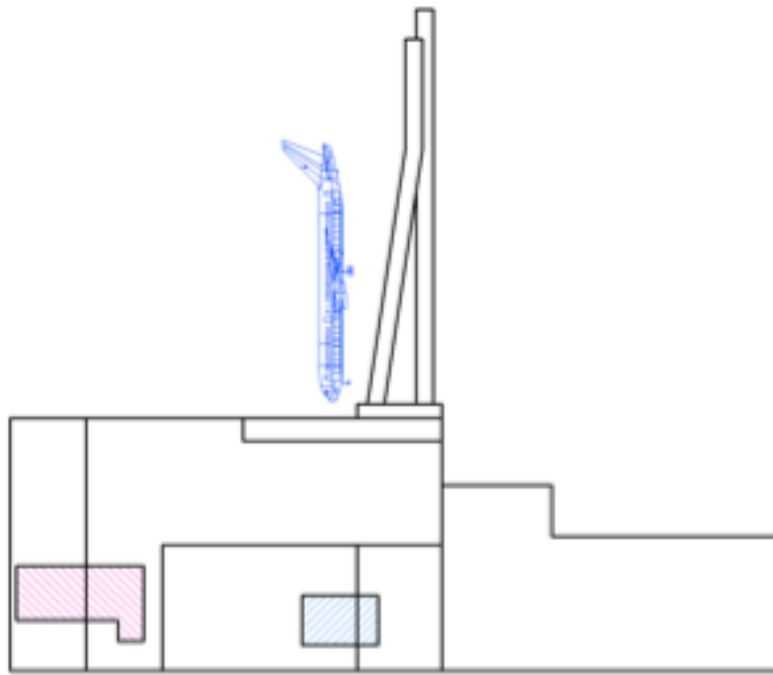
Reactor building of Unit 2, view from the east side. The building and airplane are shown to the same scale
